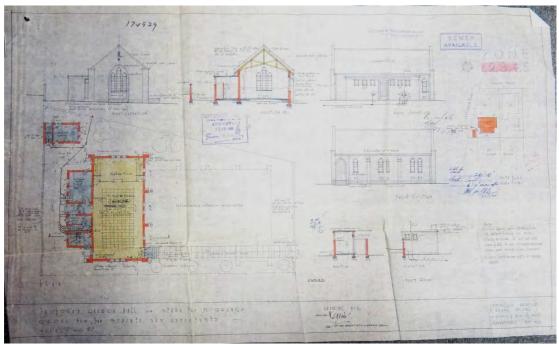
Proposed Church Hall on Stand 51, Orange Grove for the Sevenths Day Adventists Plan was drawn in 1945 and Church building erected in 1949 (Source: City Council of Johannesburg, Plans Archive)
